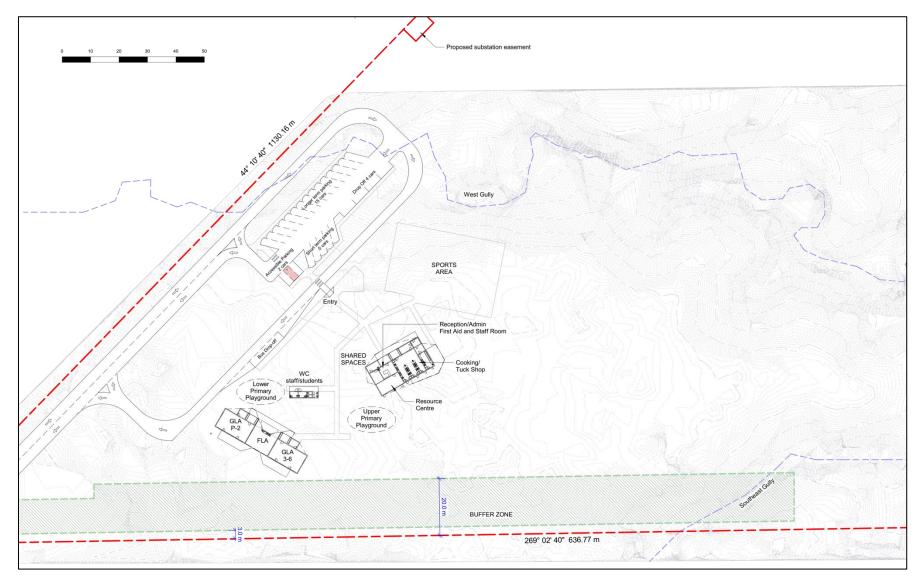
PROPOSED STAGE 1 PLAN
